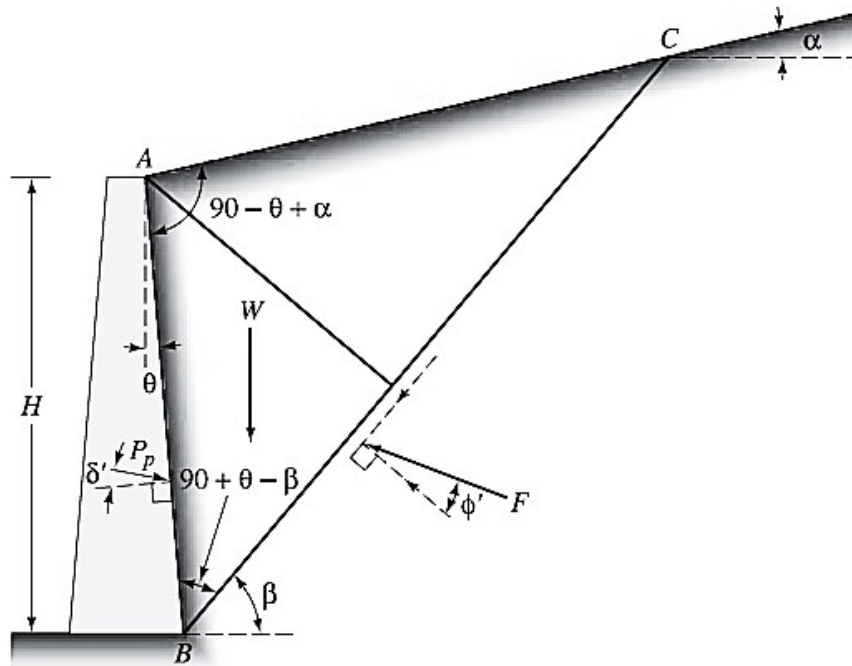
a Trial failure wedge (After Braja M. Das "Fundamentals of Geotechnical Engineering")
